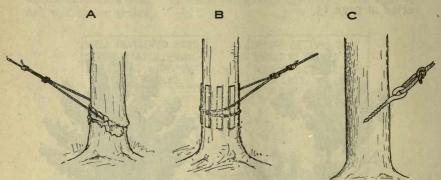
Trees Should Not Be Used to Anchor Guy Wires Except in an Emergency.
